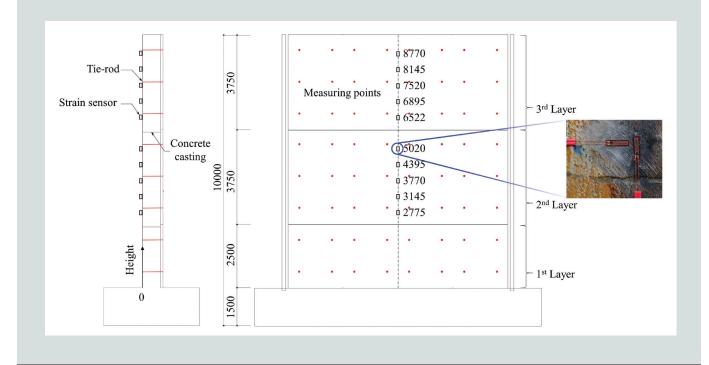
Strain sensors and measurement locations for the wall liner. Note: All strain sensor locations are listed in millimeters. 1 mm = 0.0394 in.
